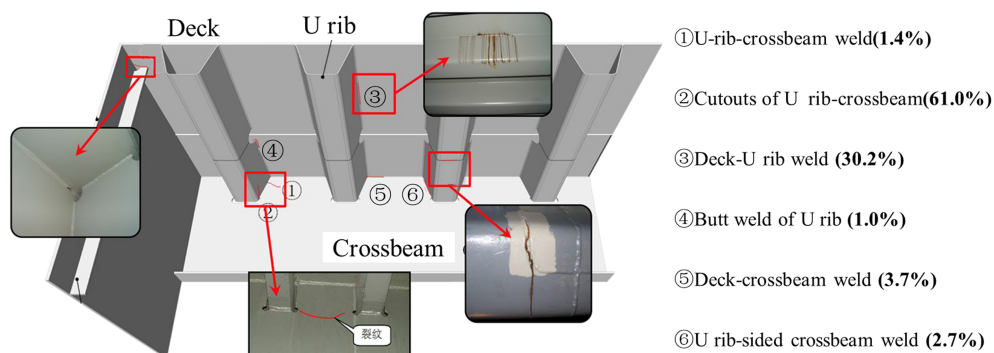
Summary of fatigue failure modes in orthotropic bridge deck (OBD)⁷ [Colour figure can be viewed at wileyonlinelibrary.com]
